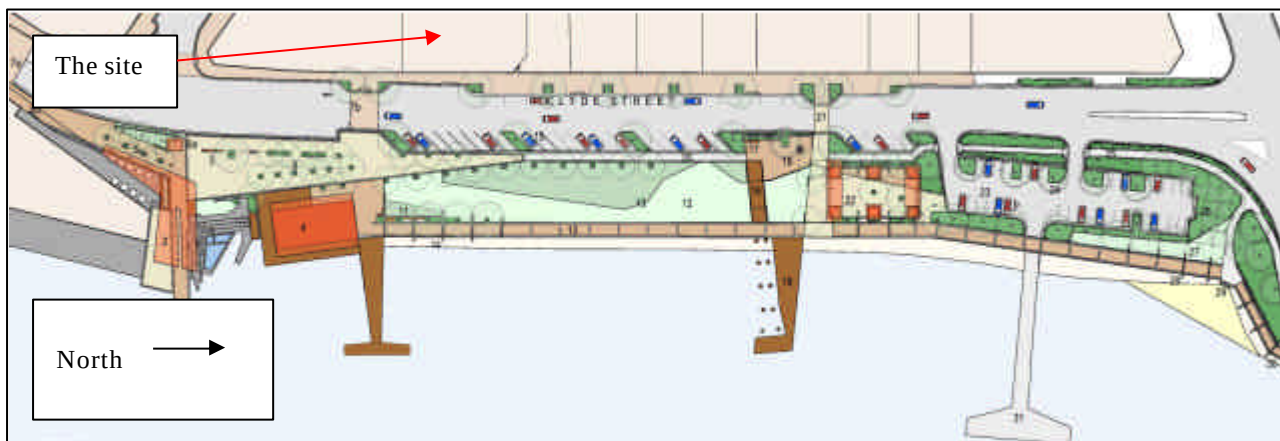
Plan showing the proposed Batemans Bay Foreshore Park beautification works
